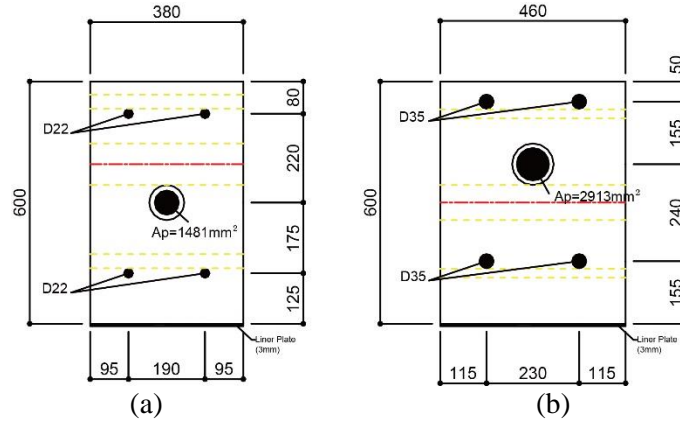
Cross-sections of the specimen: (a) Vertical section; (b) Horizontal section
